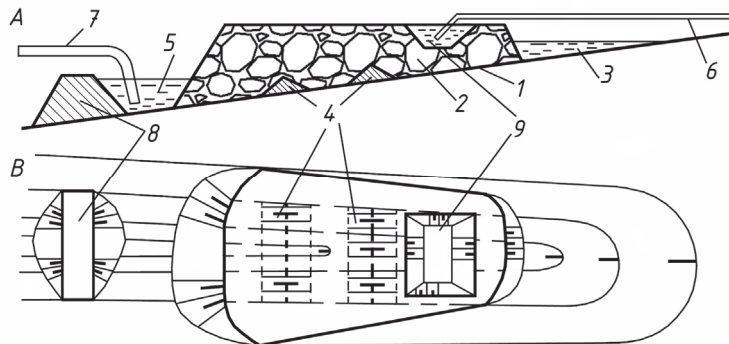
Construction of the filtering array with waterproof stopping: A – longitudinal section; B – plan view; 1 – the bottom of the filter; 2 – filtering array; 3 – receiver for contaminated water; 4 – waterproof stopping; 5 – lodgment of purified water; 6 – conduit for feeding for contaminated water; 7 – conduit for purified water removing; 8 – water retention levee.
